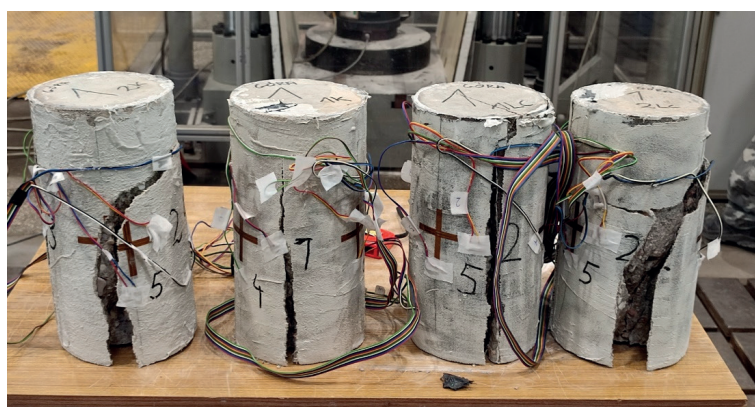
Failure of specimens, from left: 2K, 1K, 1L, and 2L
